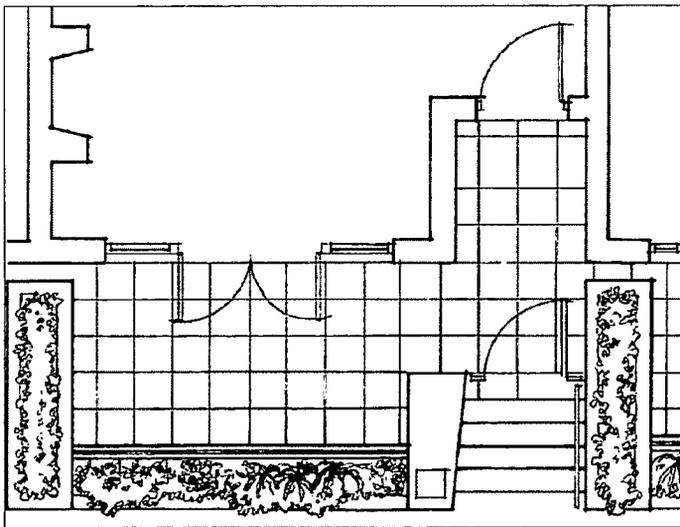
Plan diagram of "domestic" front entry and porch of a typical townhouse unit, from Elizabeth MacDonald, "Street-Facing Dwelling Units and Livability," 2003.
